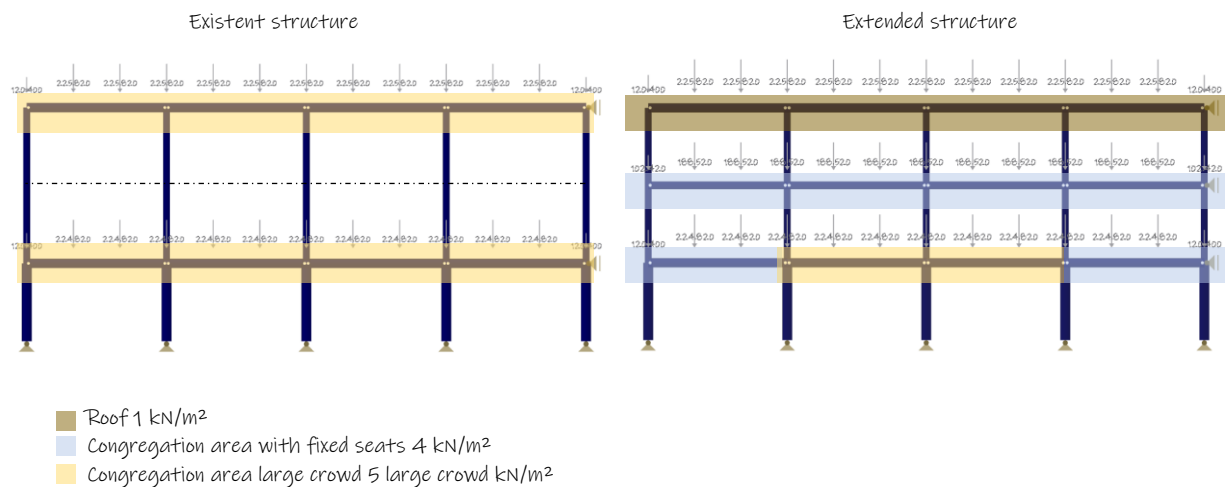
The existing convertible scalable design structure and original loads (left) contrasted with the extended structure and updated loads (right). A detailed legend for clarity (bottom).
